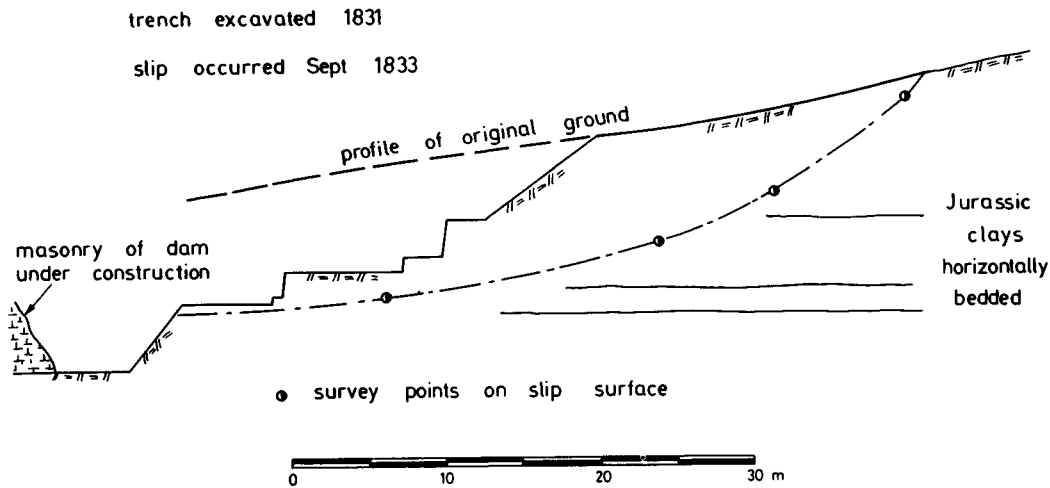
Slip in foundation trench, Grosbois Dam (Collin, 1846)
